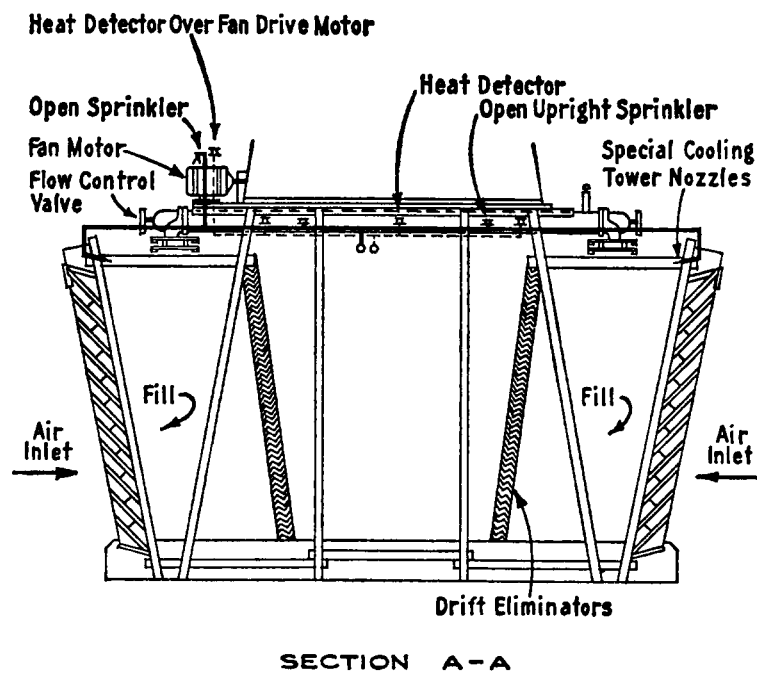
Typical deluge fire protection arrangement for crossflow towers.
